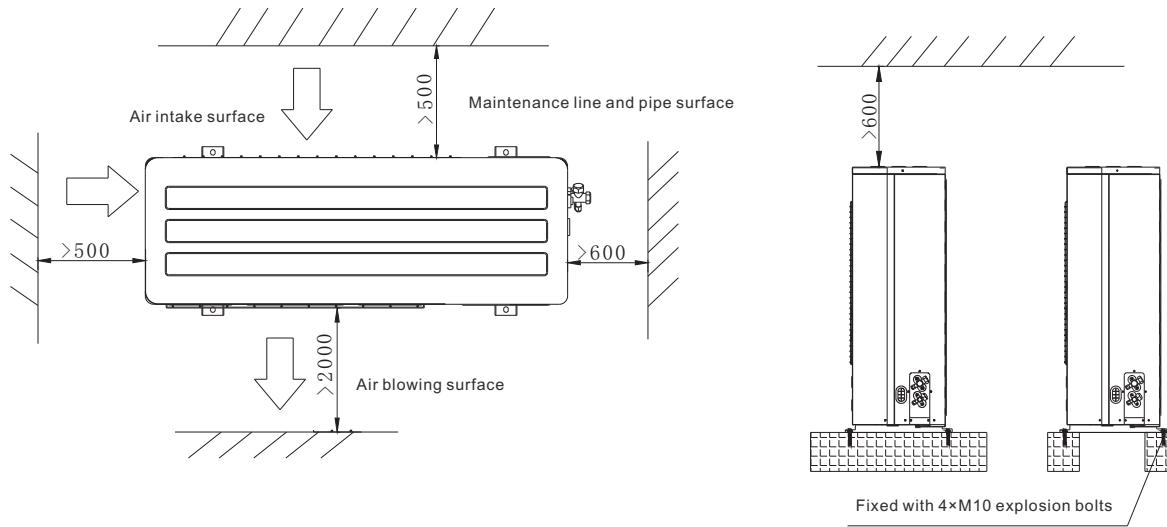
Outdoor unit installation and maintenance space Unit:mm
